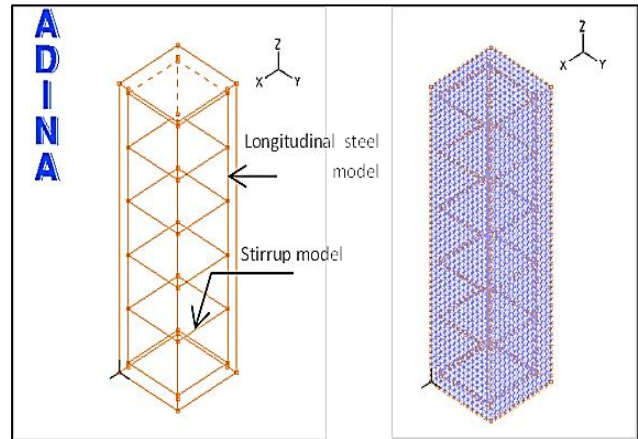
a) The concrete and reinforcement model; b) The mesh geometry for the concrete and reinforcement.
